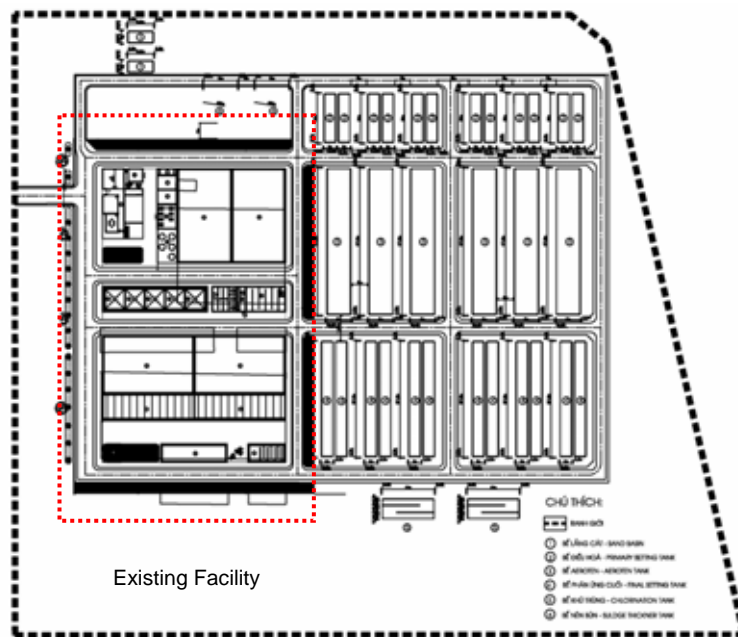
General Layout Plan of Wastewater Treatment Plant
